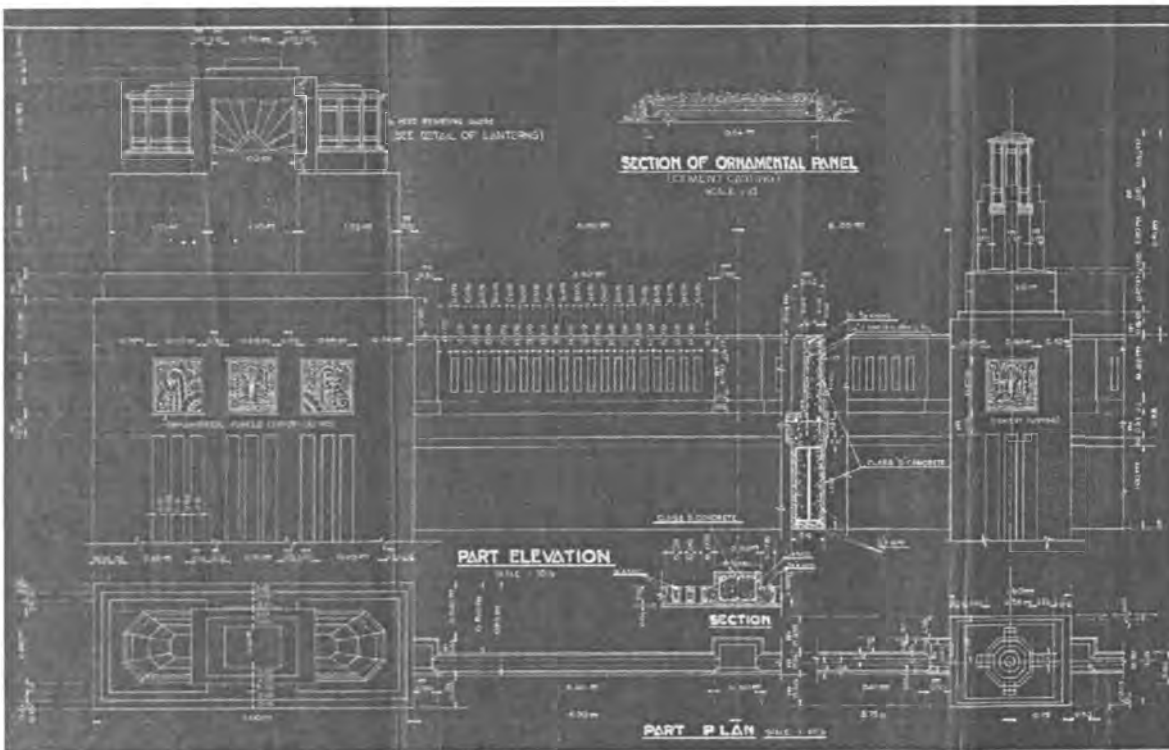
Detail of the pier, pillar and balustrades of Martín Peña Bridge. ²
